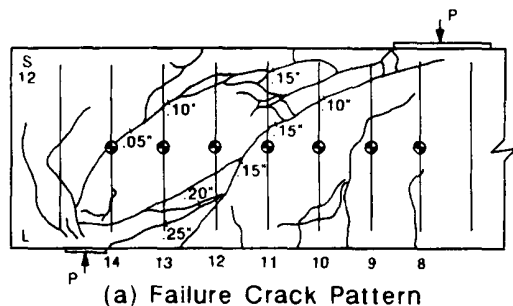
Improper anchorage of Stirrup 10 in Beam 12
